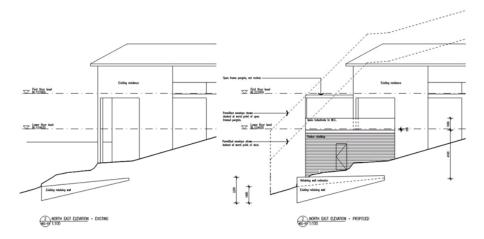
Existing and Proposed North East Elevation (B Turner, 2022)
